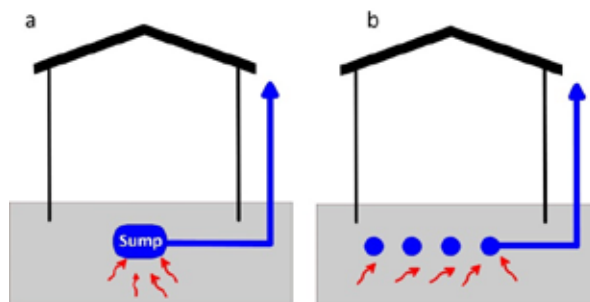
Depression of the subsoil for newly constructed buildings using (a) a sump or (b) drainage pipes.
